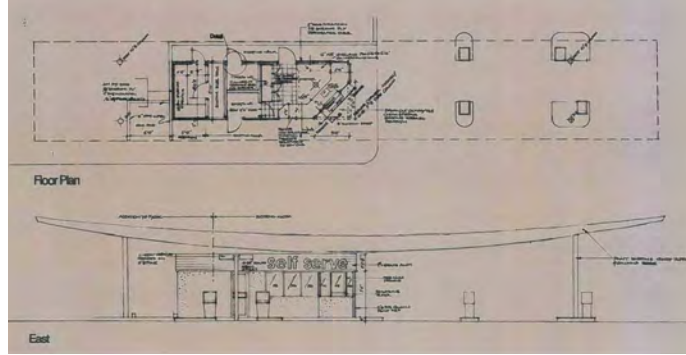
Undated floor plan and east elevation of the gas bar on the Site (ATA Architects Heritage Report, 2008).
